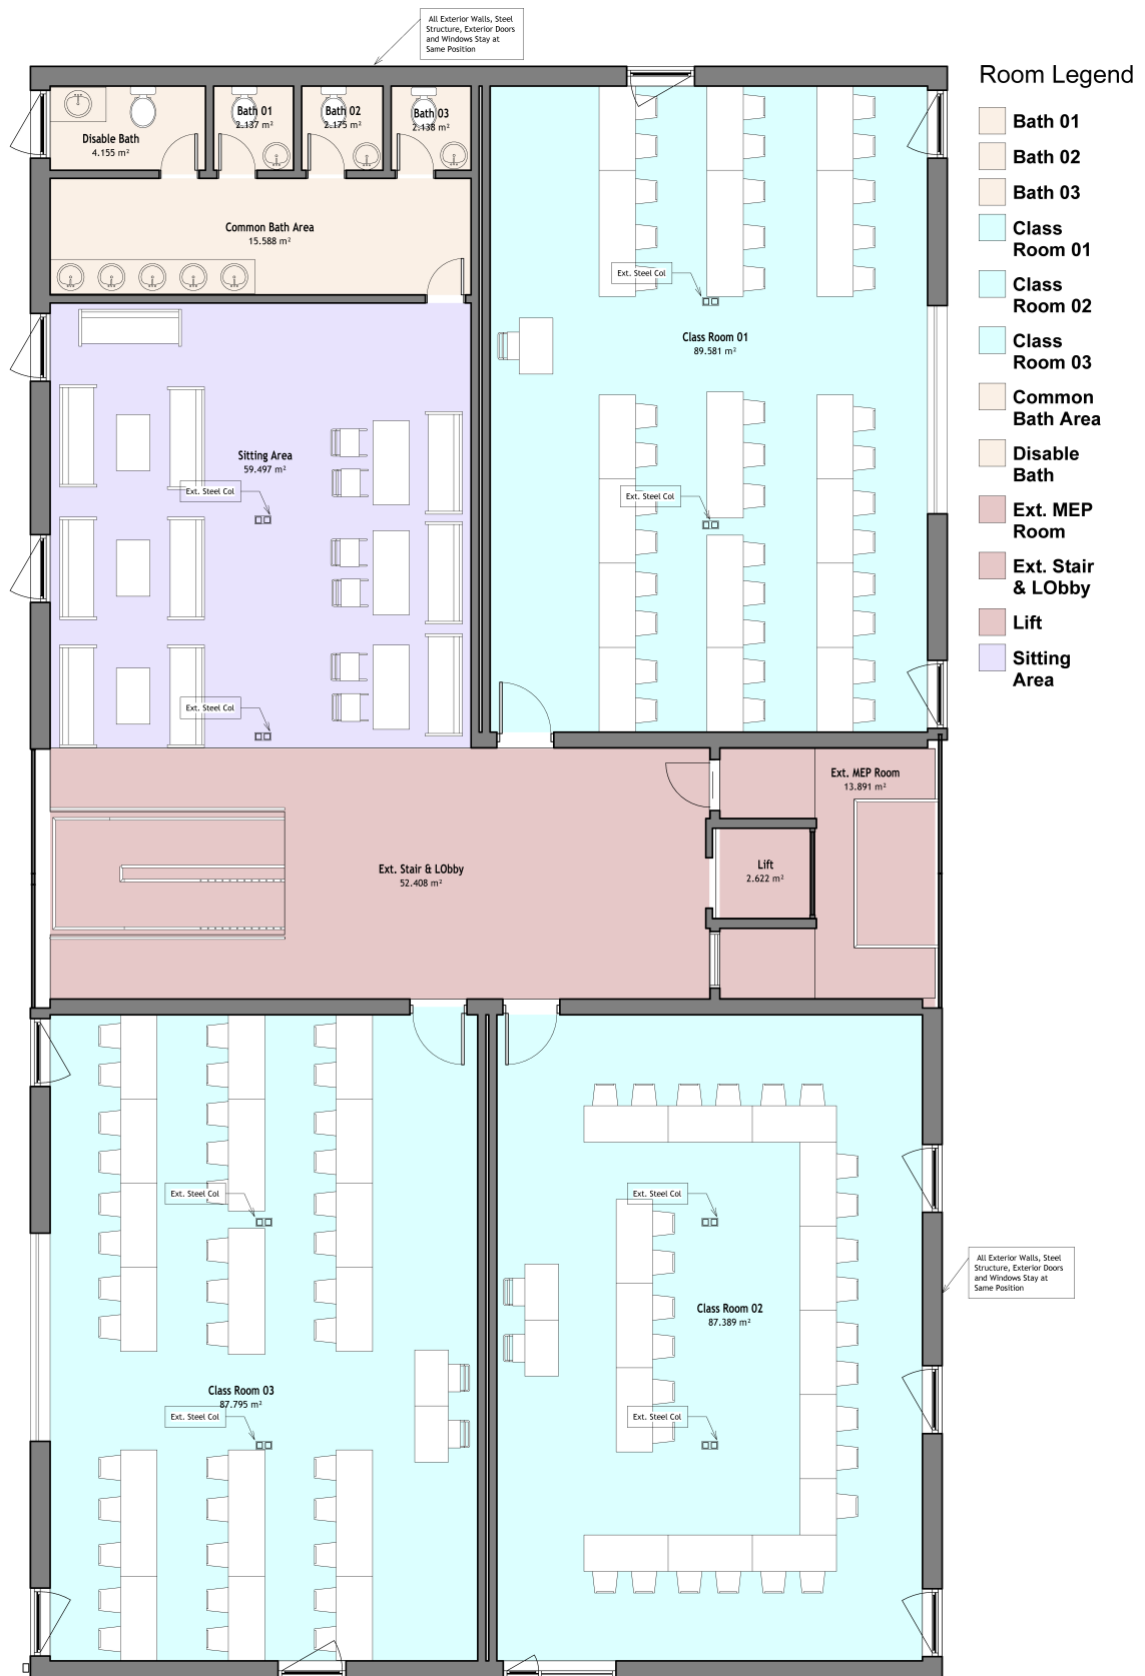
Proposed Layout of Typical Floor HSB Living Lab
